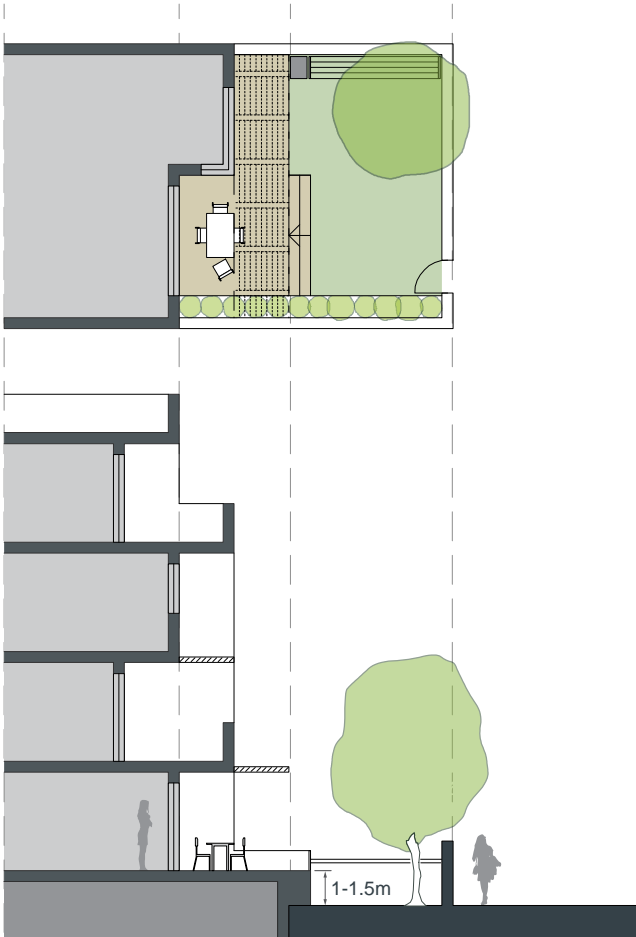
L.4 Plan and section of a ground floor apartment with an elevated terrace and a level private courtyard
